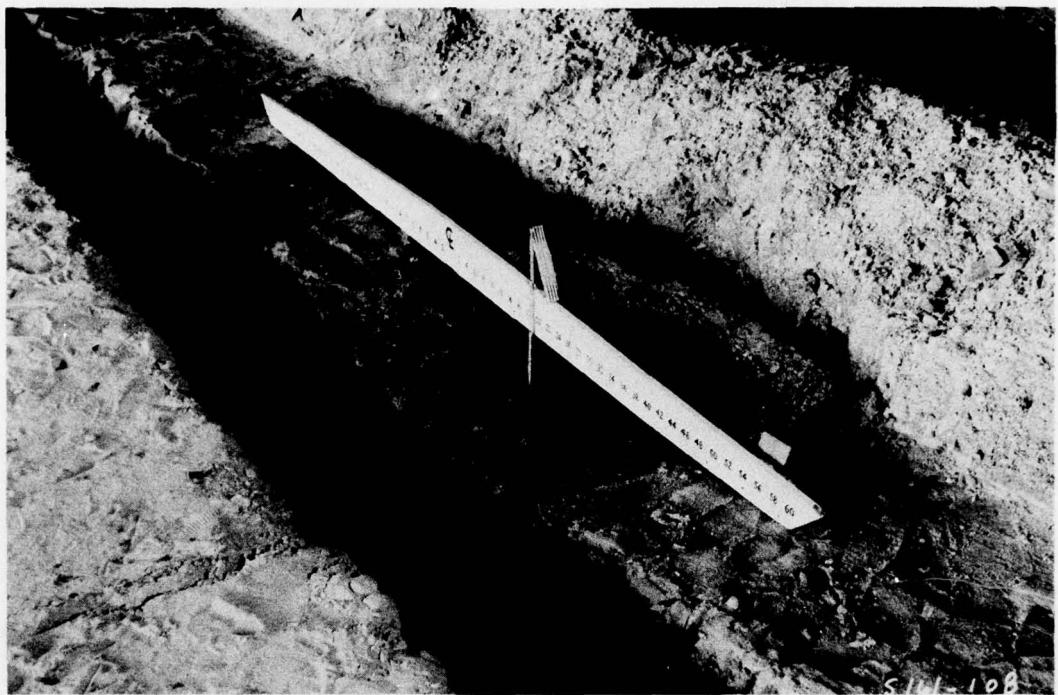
Test Section No. 3, item 3, trench after 200 coverages
